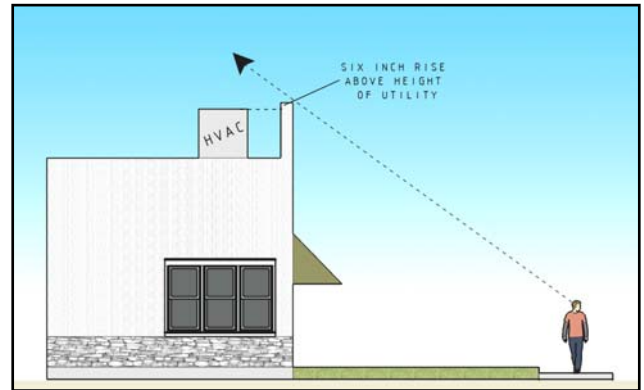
Minimum parapet height should be no less than that of the tallest roof-mounted utility.
